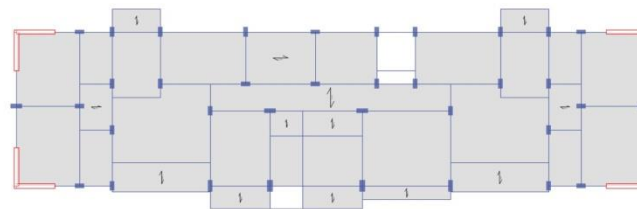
Model 3:- shear wall at all 4 corners of the building.
